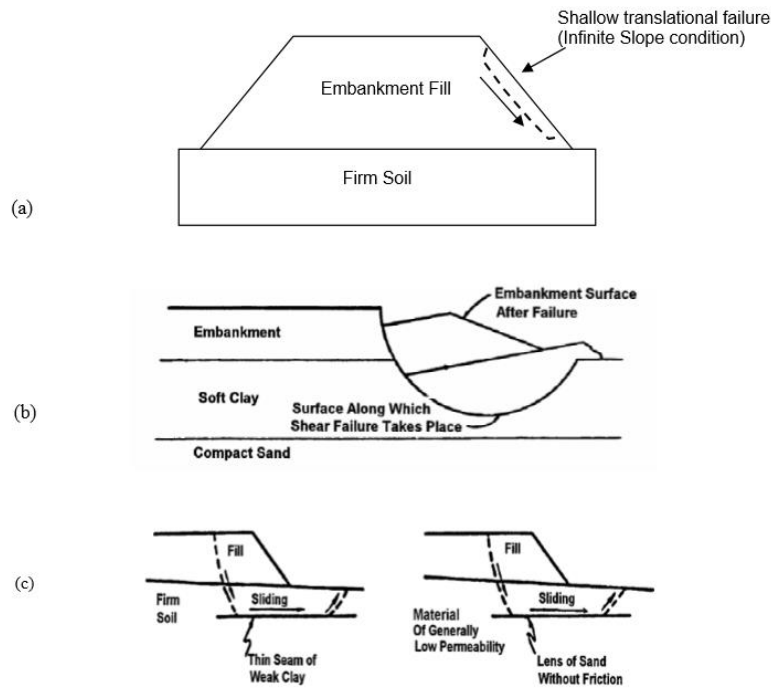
Embankment Failures: (a) Infinite slope failure in embankment fill, (b) Circular arc failure in embankment fill and foundation soil, (c) Sliding block failure in embankment fill and foundation soil (FHWA 2001a)
